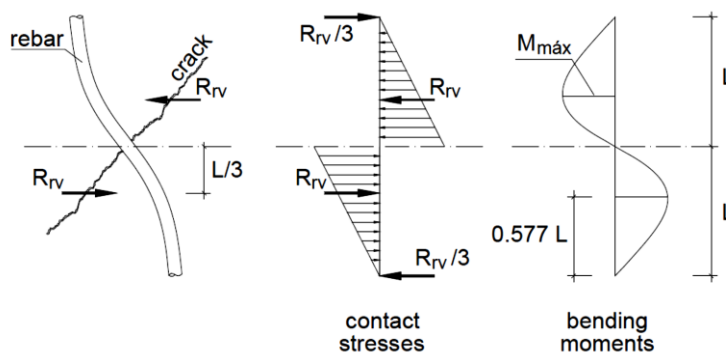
Dowel mechanism of vertical reinforcement at shear failure of a reinforced masonry wall (Tomažević, 1999).
